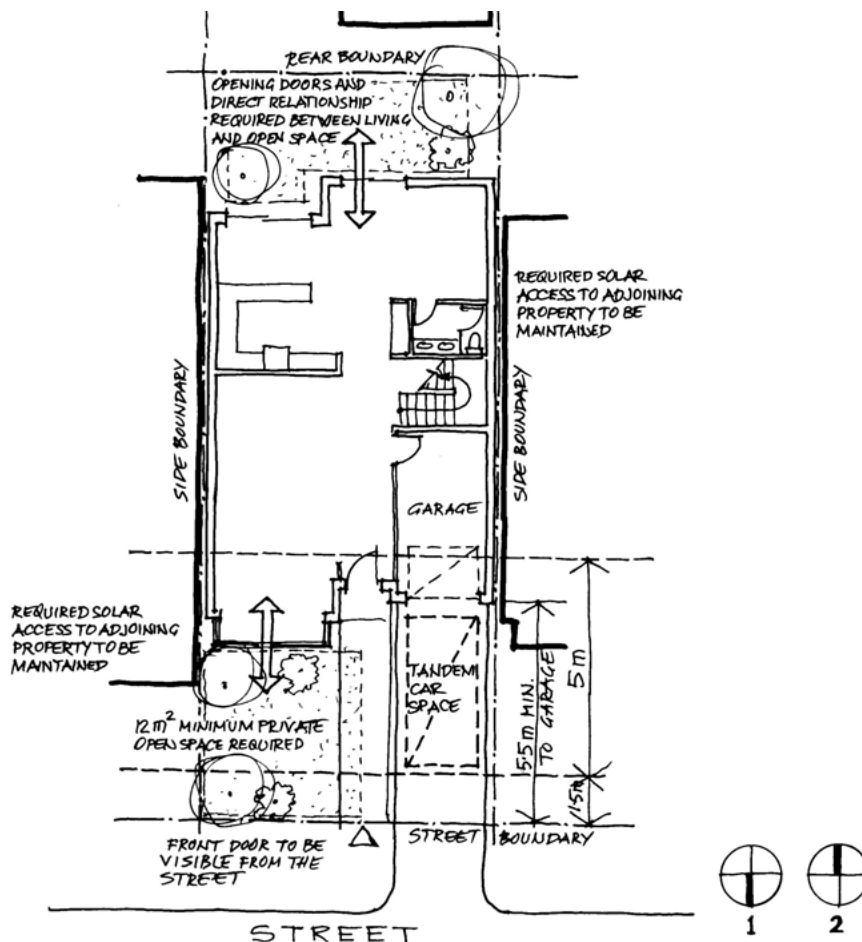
Terrace house layout - north to the street.
